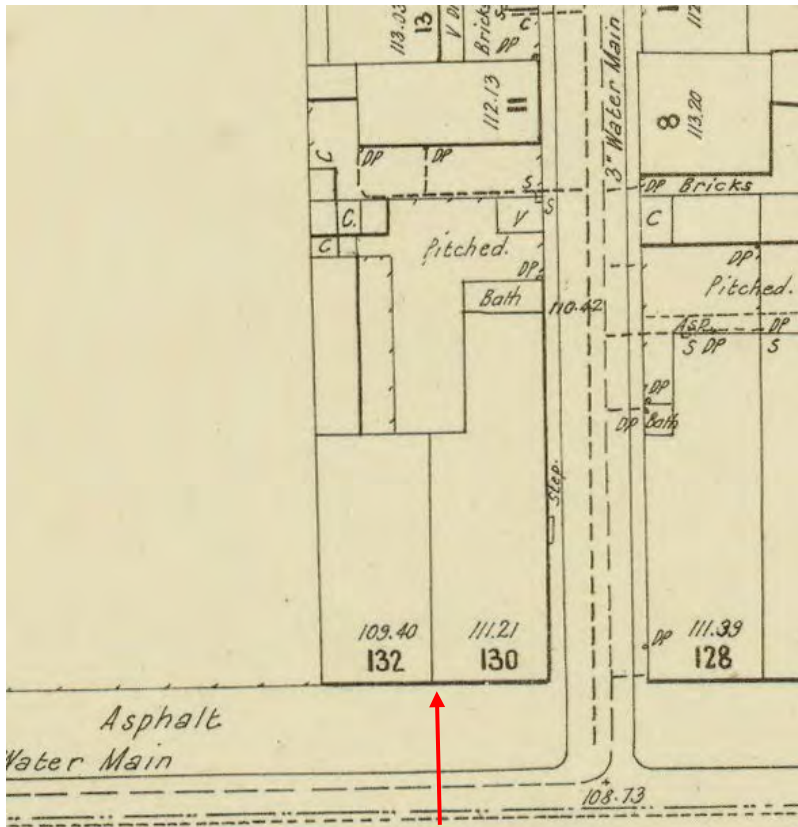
MMBW detail plan no. 1178, 1896, with nineteenth century buildings indicated. Note street numbering has since changed, and 144-146 Queensberry Street is shown as nos 130 and 132
